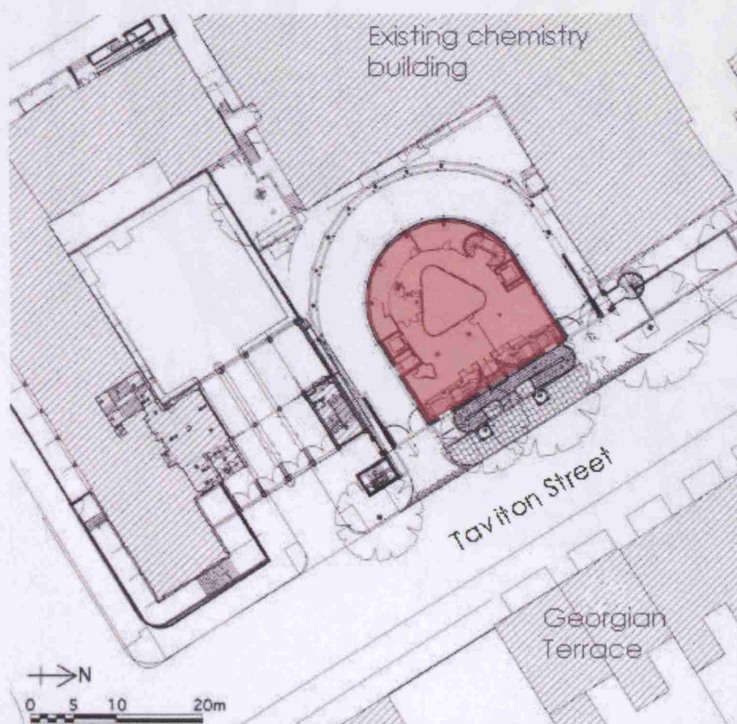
Site plan for School of SSEES. The building is highlighted in red. (Source: Short, 2004 pp. 195)
